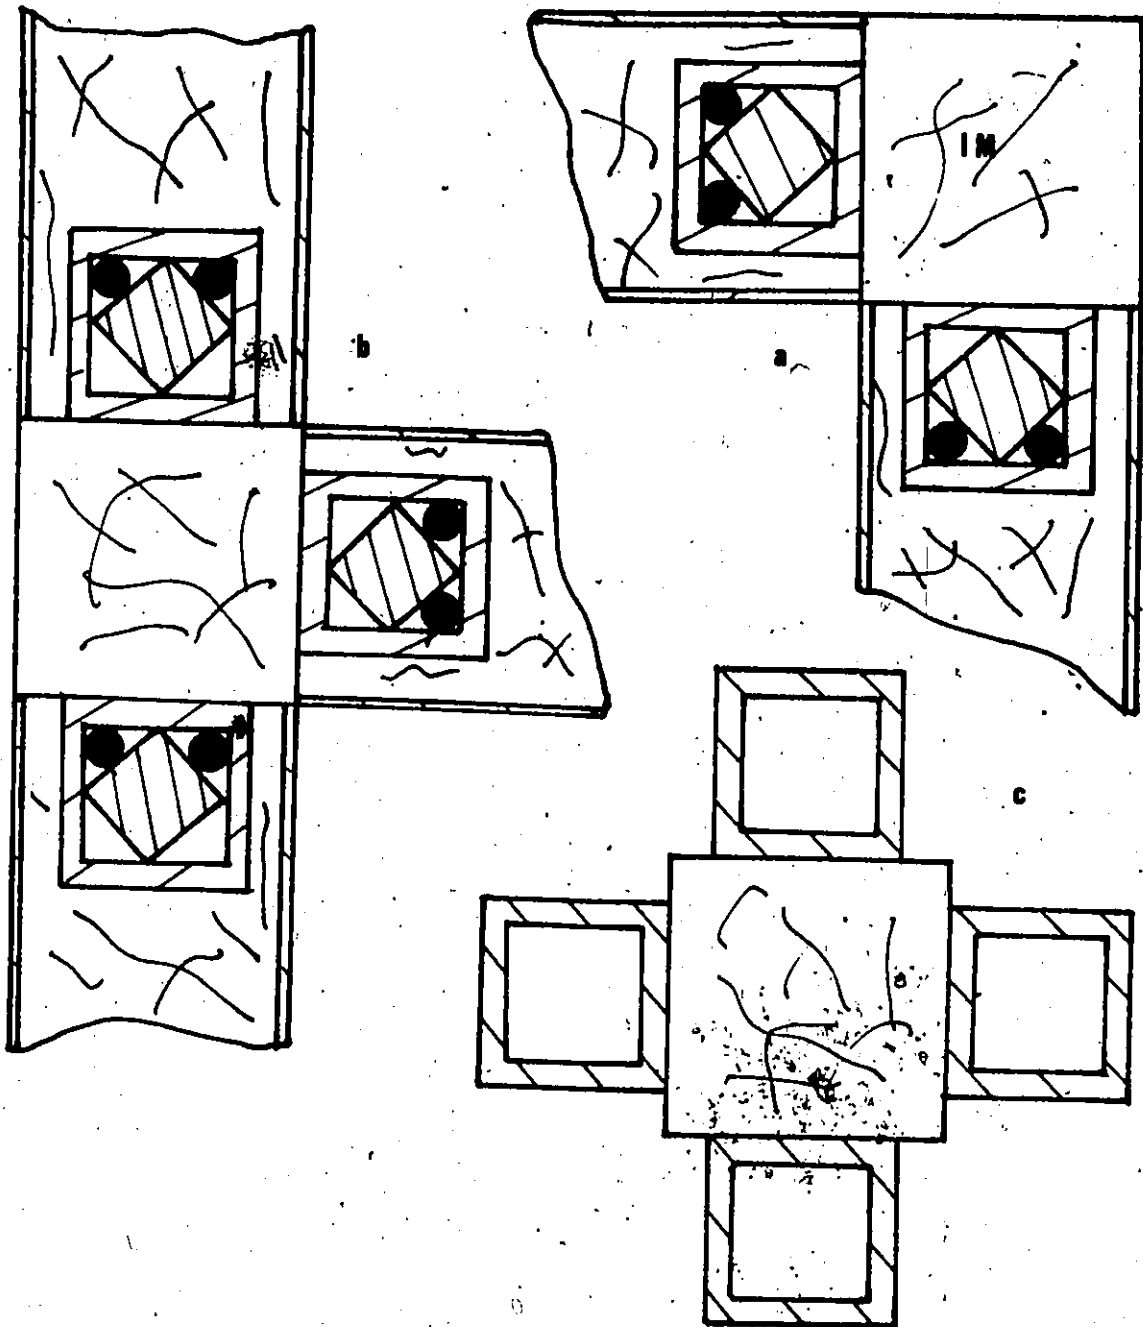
CORNER, WALL, TO FLOOR AND INTERMEDIATE CONNECTIONS
